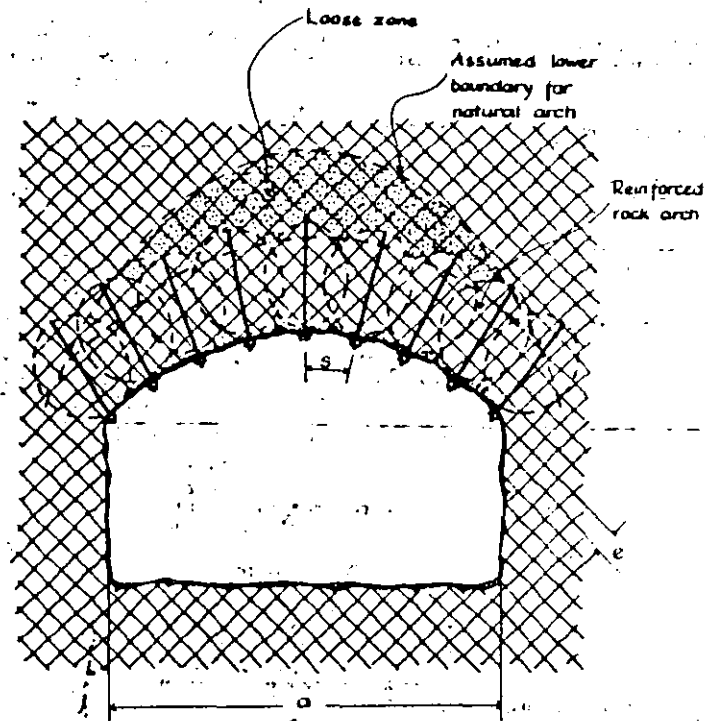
The concept of a natural arch, developing above the curved roof of an underground excavation in heavily jointed rock. The "loose zone" of rock below the natural arch has been reinforced by tensioned rockbolts. This creates an artificial arch near the ceiling of the opening. Note the loose rock between the bolts near the ceiling of the opening. This rock must be supported by wire mesh or shotcrete.
